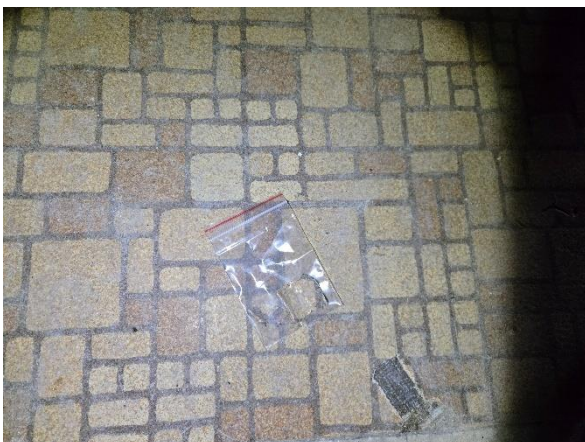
Sample A-92. Hemlock, Asbestos Containing Vinyl Sheet Flooring.
